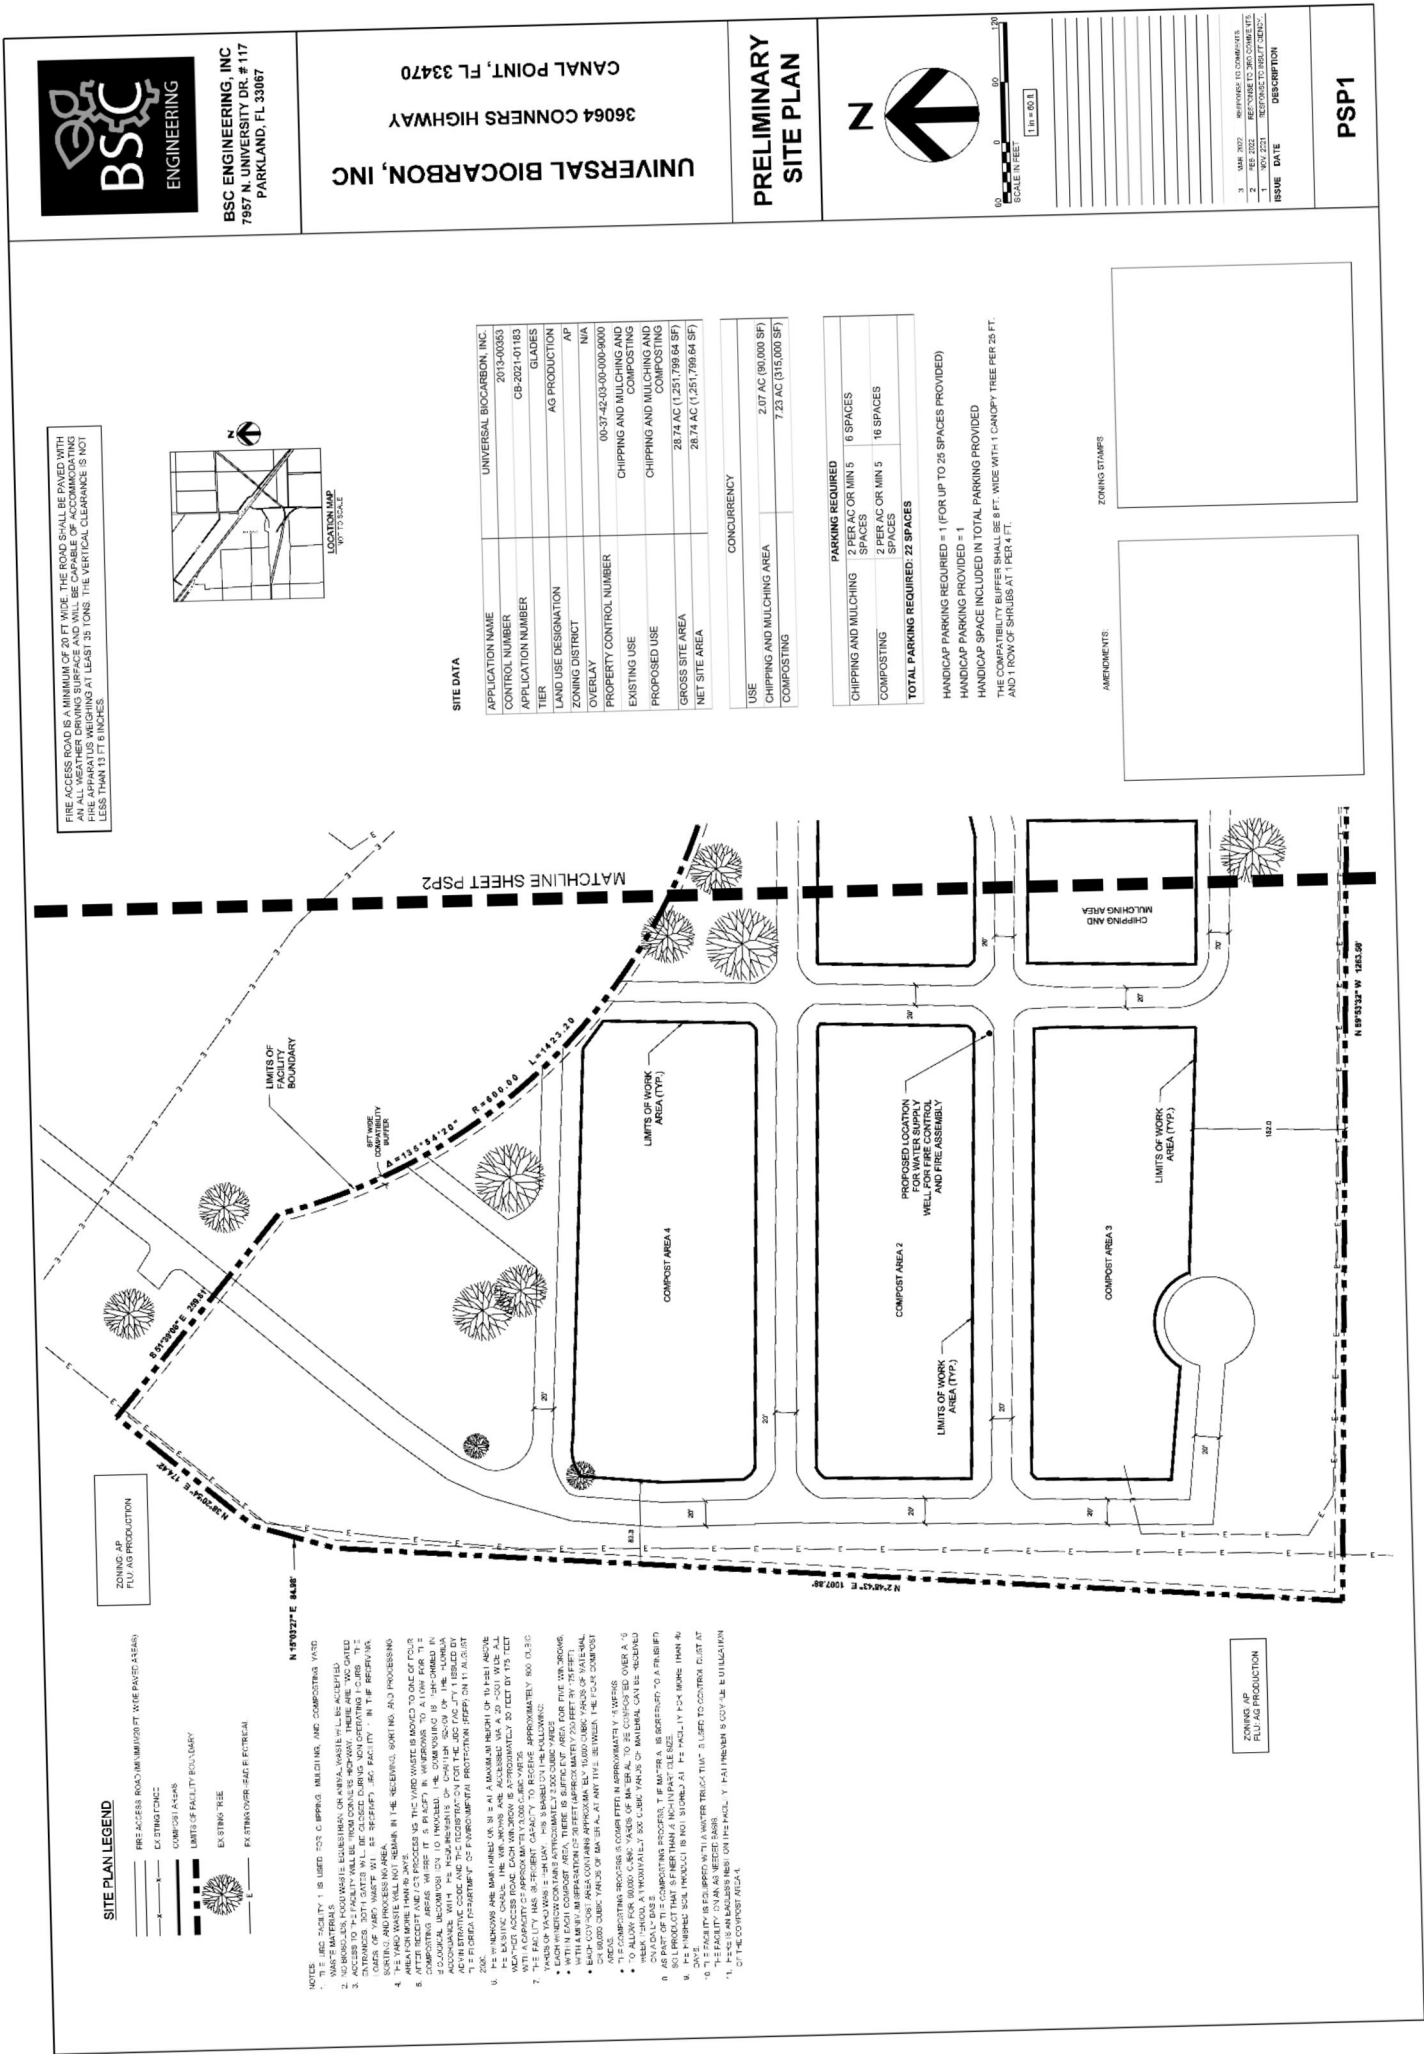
Preliminary Site Plan dated April 14, 2022 (page 2 of 2)
